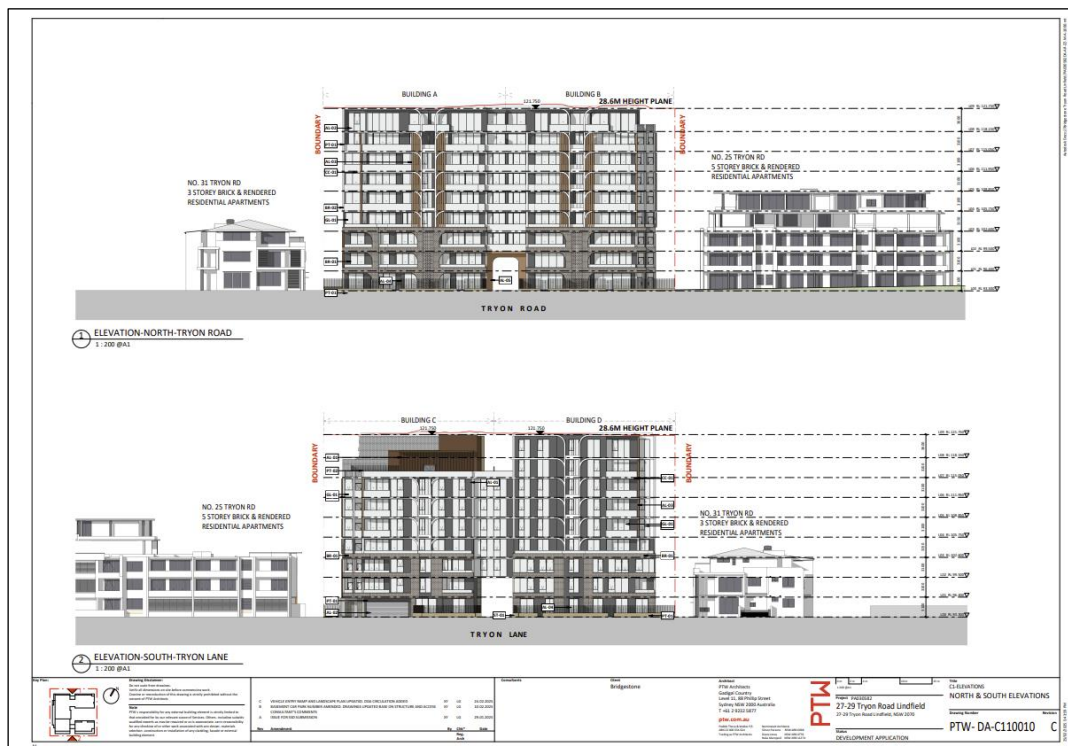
North and South Elevations for the proposed residential flat building. (Source: PTW Architects, North & South Elevations, Drawing No. PTW-DA-C110010, Rev. C)
